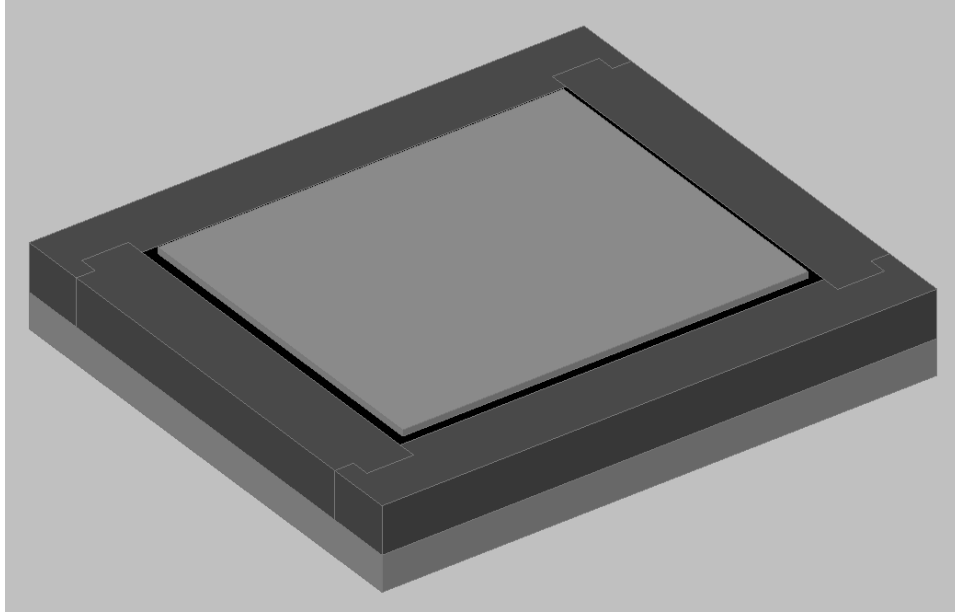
Chart. Three dimensional view of the Assembly Design IV.
